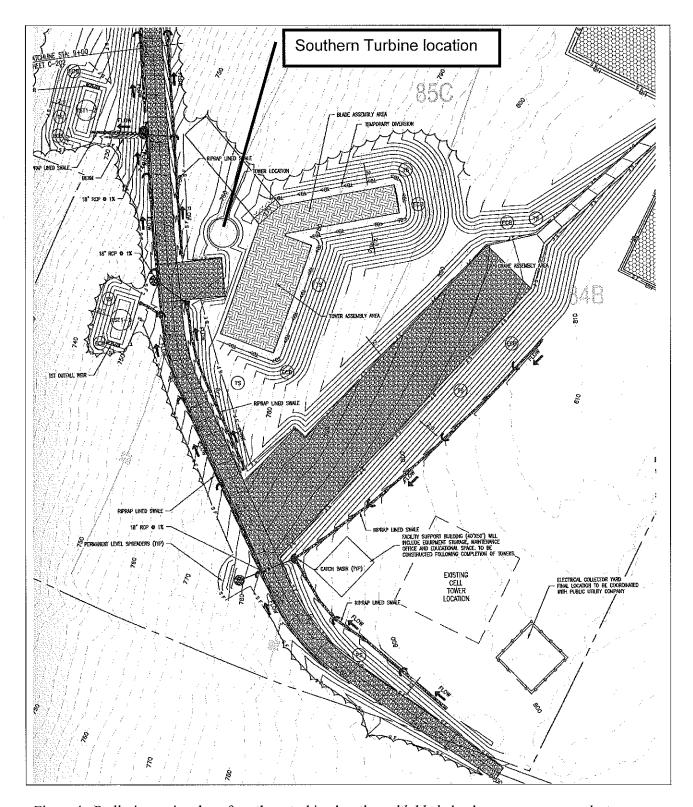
Preliminary site plan of southern turbine location with blade laydown area, crane pad, storage building location and electrical yard. (BNE 1, Vol. 2, Tab F)
